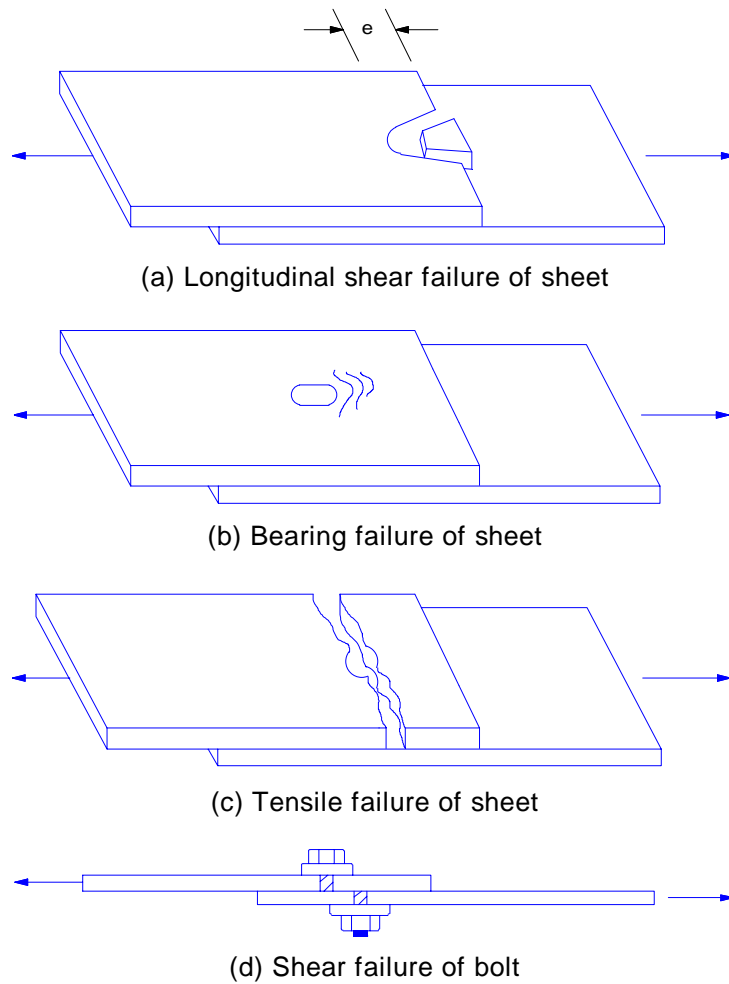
Types of failure of bolted connections
